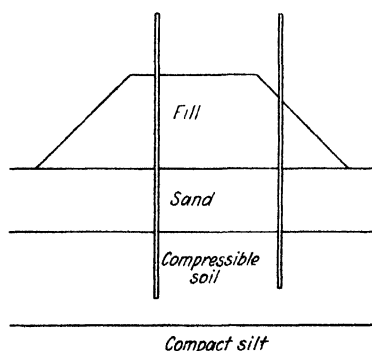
Arrangement of pipes for indicating hydrostatic pressures in soil under fill.
